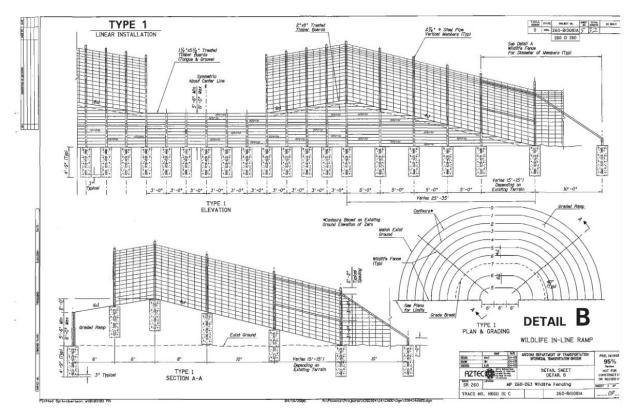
Arizona DOT Wildlife Escape Ramp Fencing
